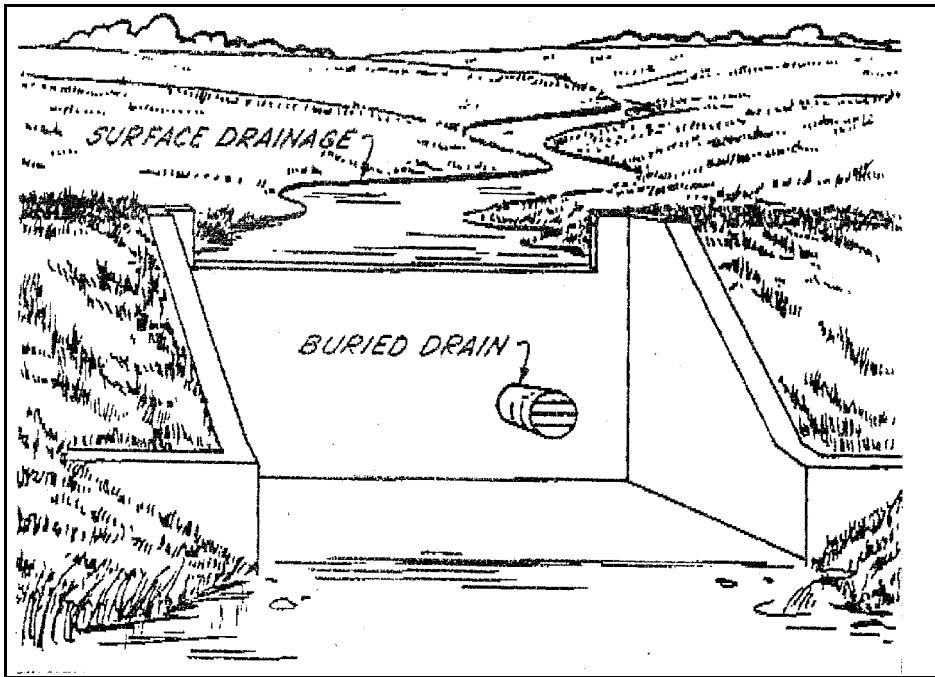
Drain outlet protection when surface water is present (Source: NRCS National Engineering Handbook)
